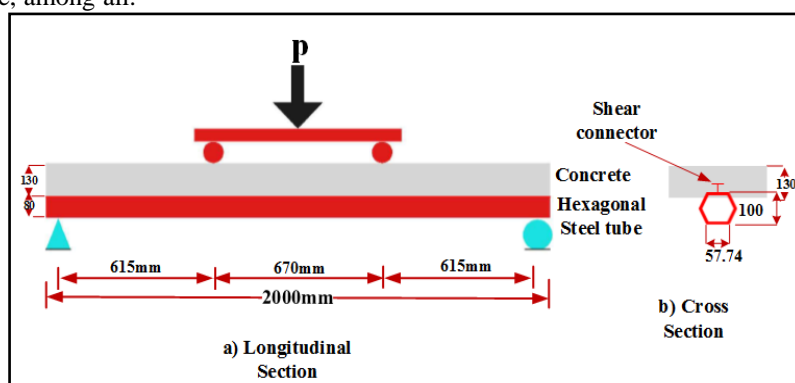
Composite Beam with Hexagonal Steel Tube Section
